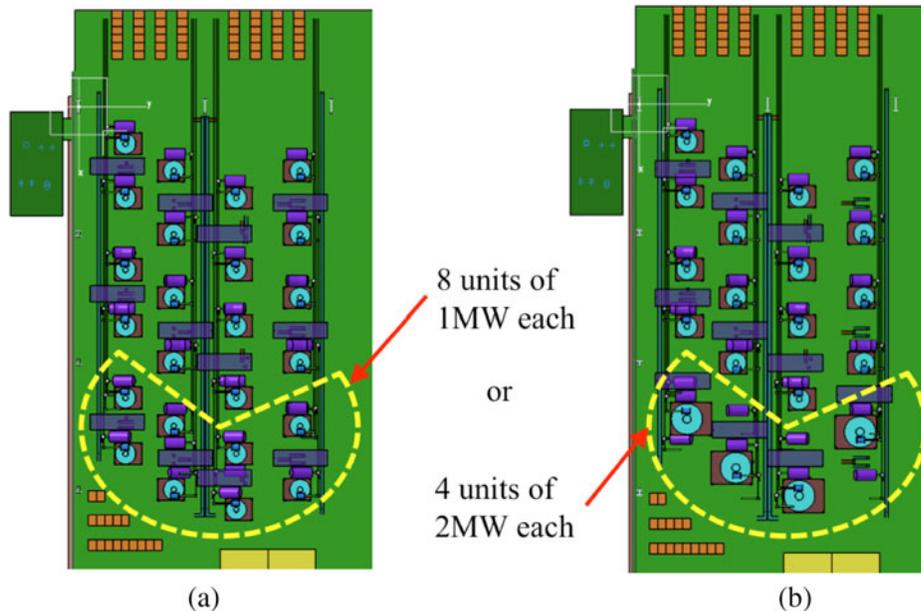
Alternative layouts in the rf building for the European sources: (a) eight 1-MW units and (b) four 2-MW units.
